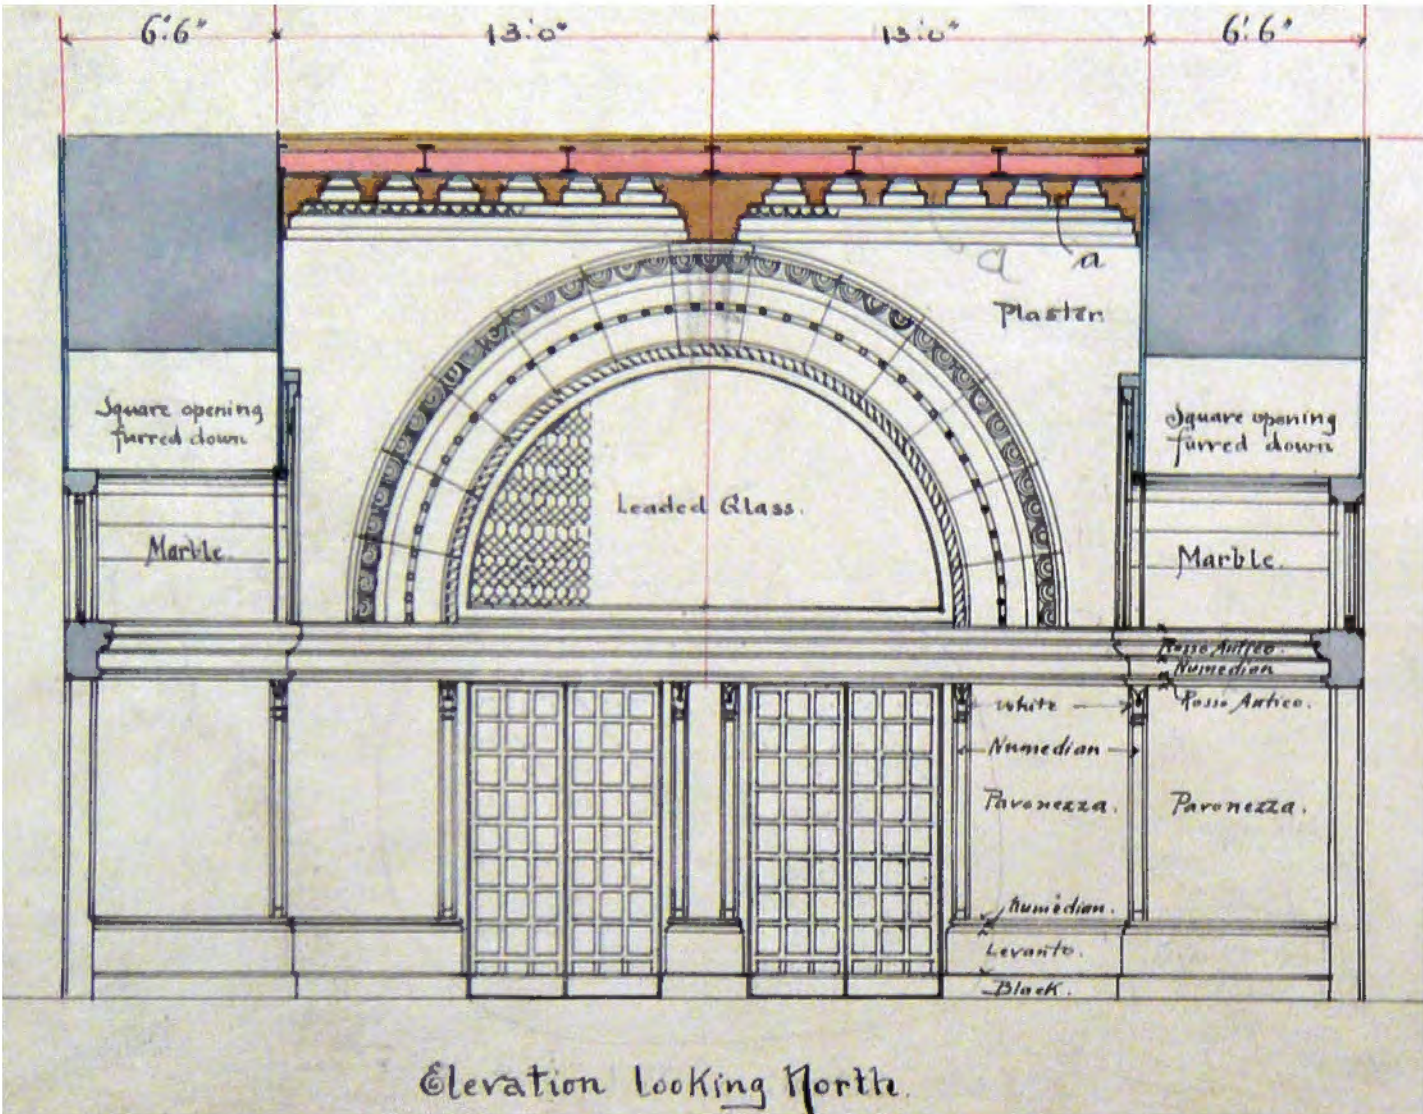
Elevation of North Wall of the Tower Lobby. Image Courtesy of the National Archives and Record Administration, Cartographic and Architectural Records, College Park, MD, Record Group 121
